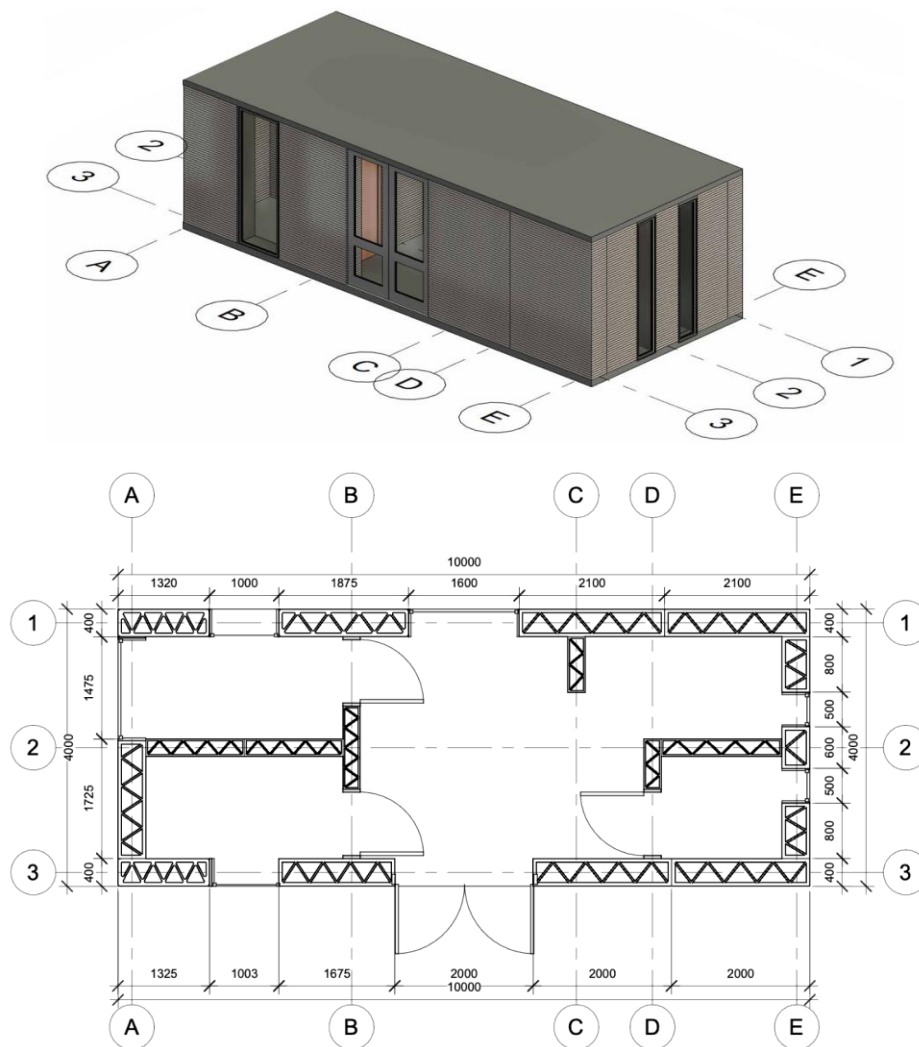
Perspective view (Top) Plan drawings (Bottom) of the 3D-printed low carbon house.
